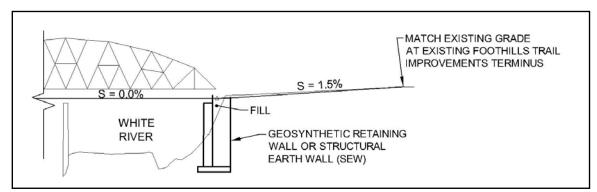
Southern White River Bridge Trail Approach – Fill Slope and Walls
